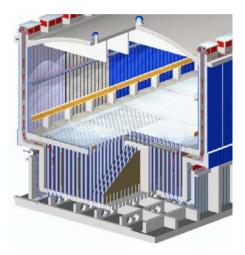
Section of chamber-type dry storage building for spent fuel storage at the MCC.
